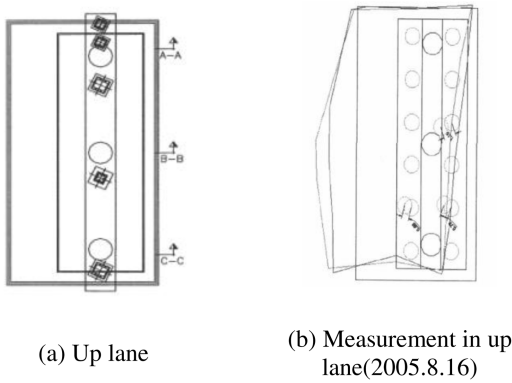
Ground plan for a strain cross section of the sheet pile in P2 section.
